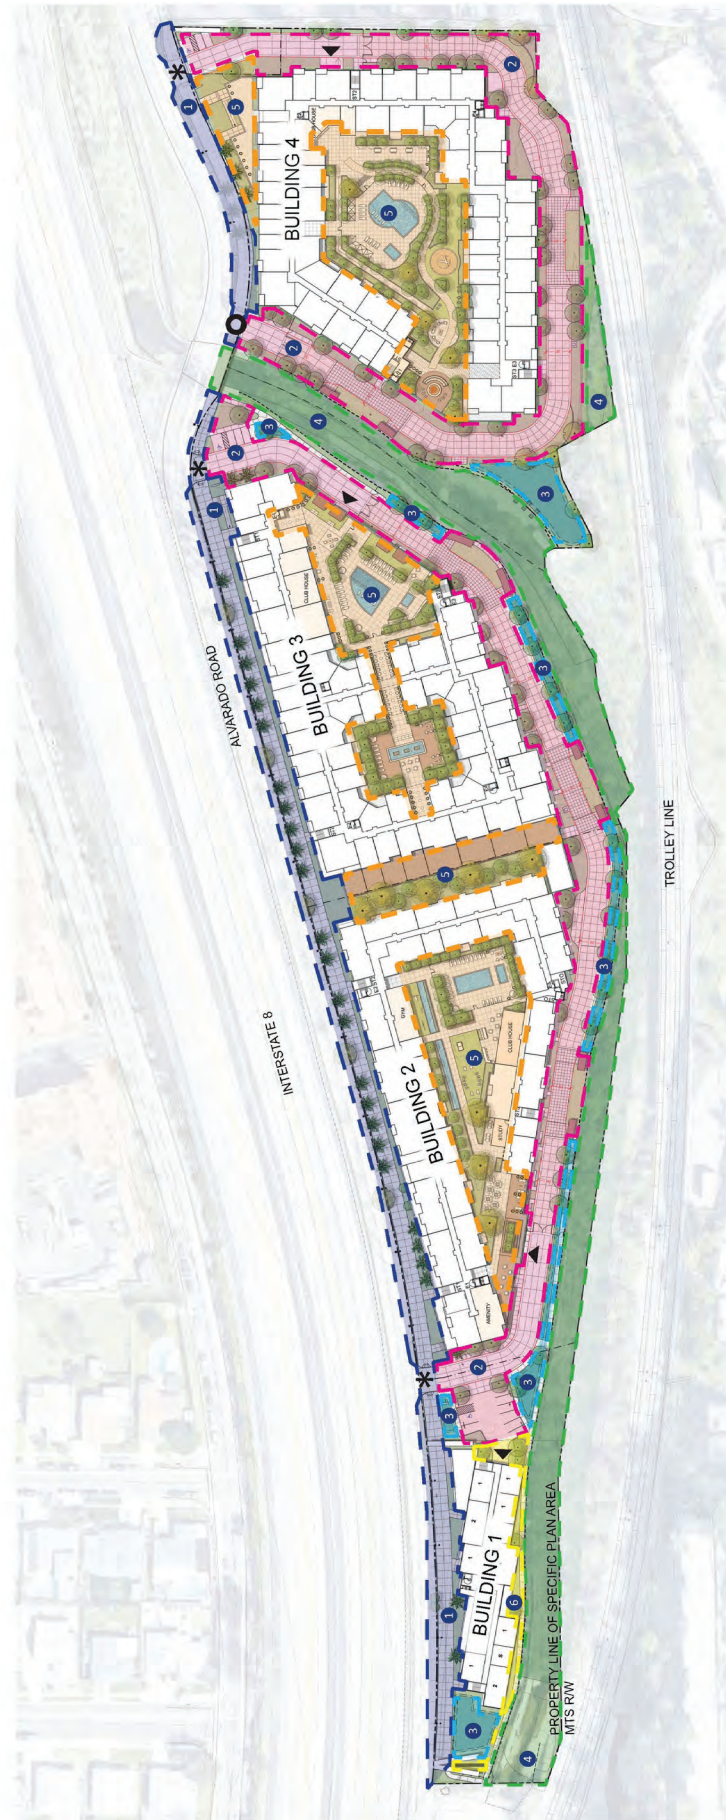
Open Space and Landscape Area Detailed Site Plan Views
